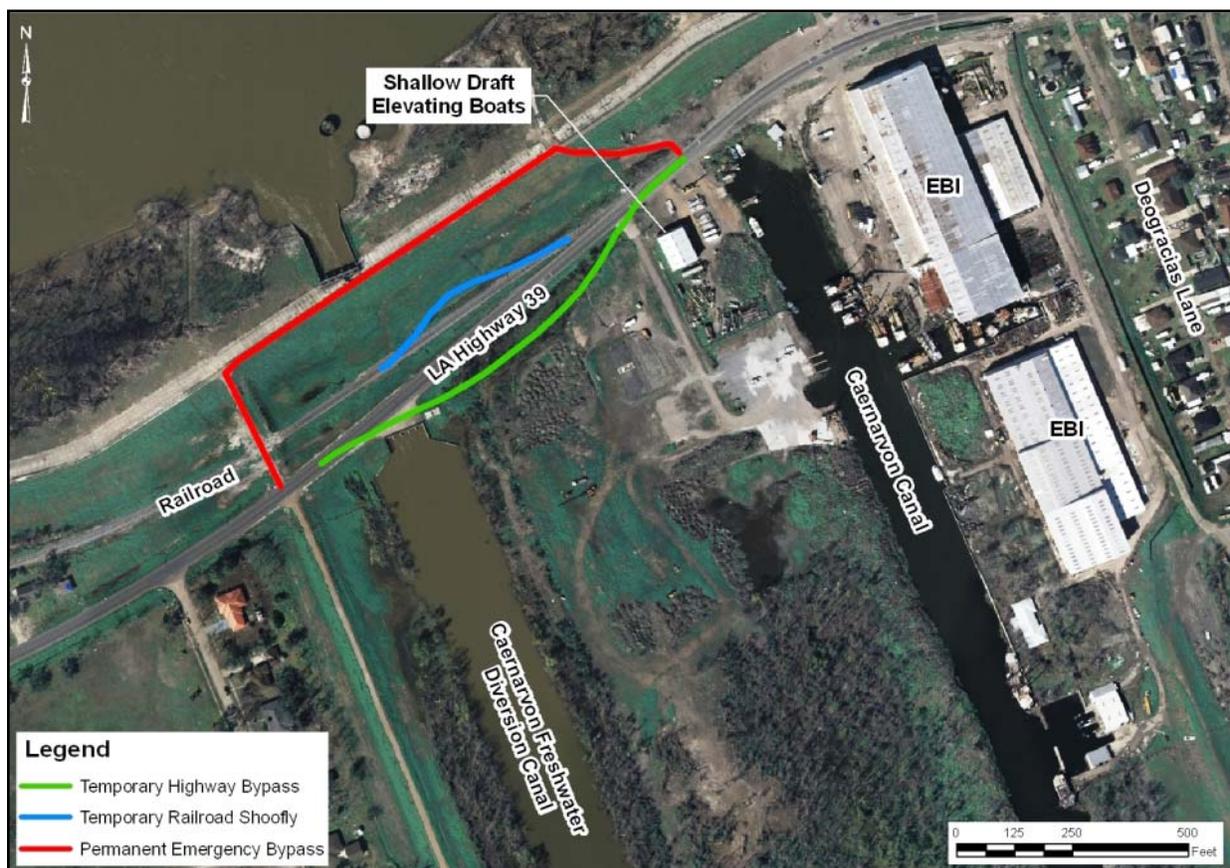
Proposed Emergency Access Route for the IER # 9 Project Area
